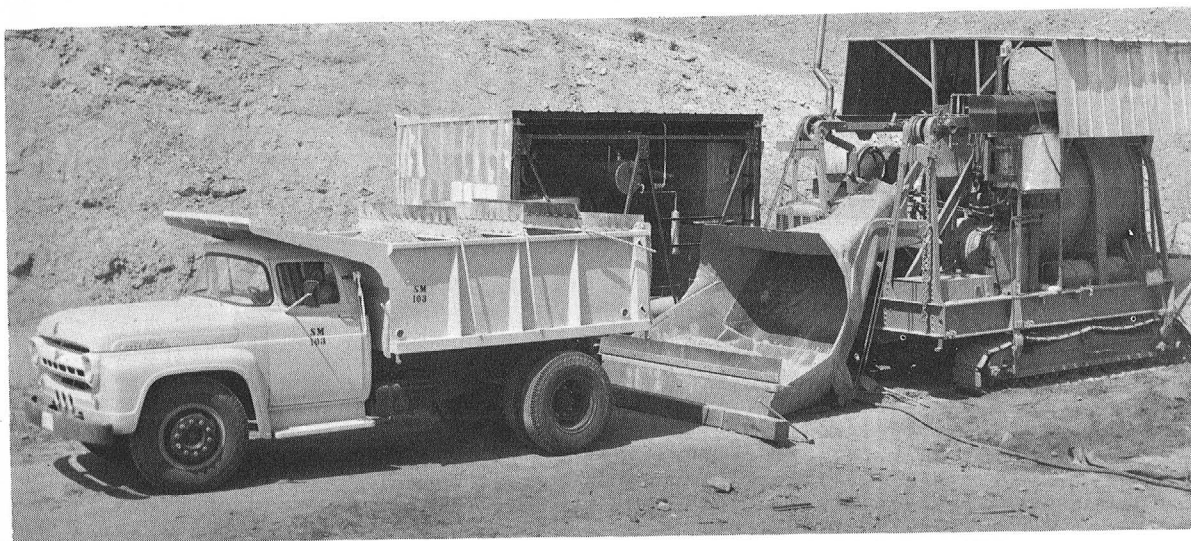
Concrete Mixer at Churn-Drill Hole.
